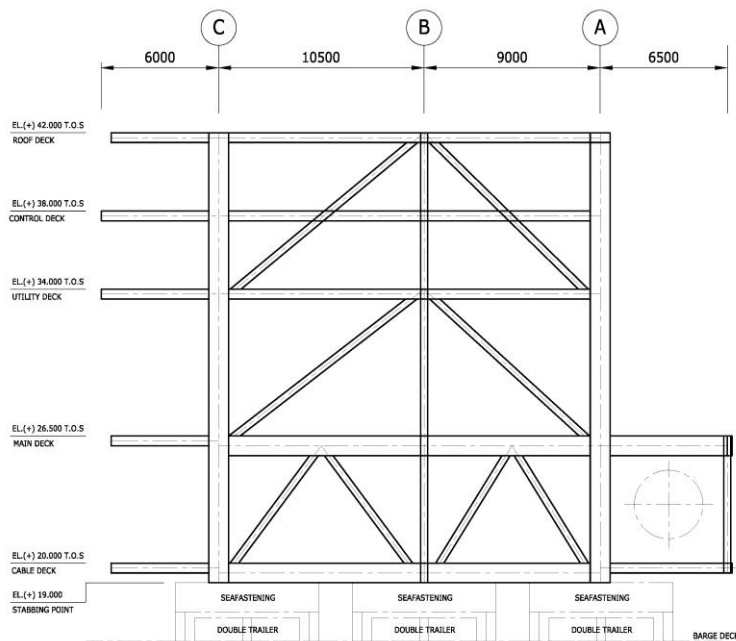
Elevation view of topside during load-out (typical for gridlines 1, 2 and 3)
